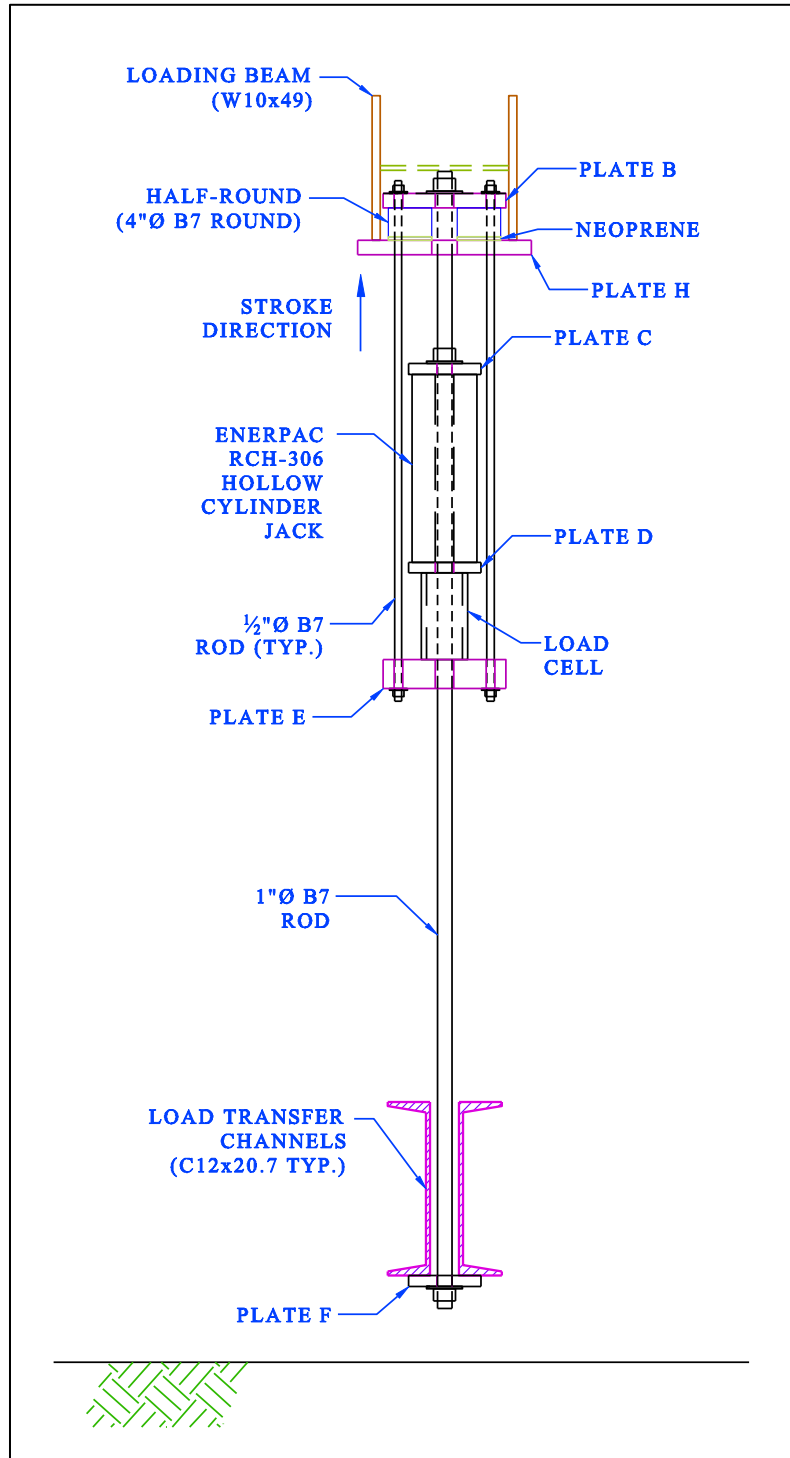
Longitudinal plane cross section view of loading rod assembly (Hampe, 2012)
